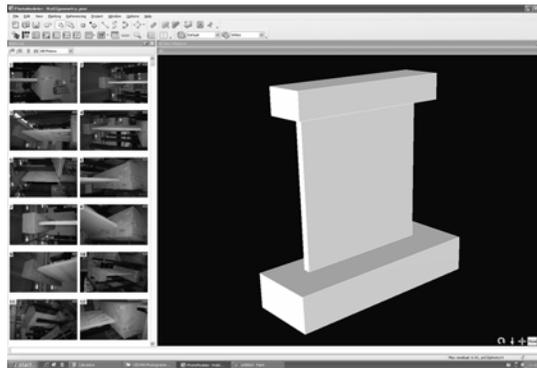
As built 3D rendering of wall specimen constructed with close-range photogrammetry
